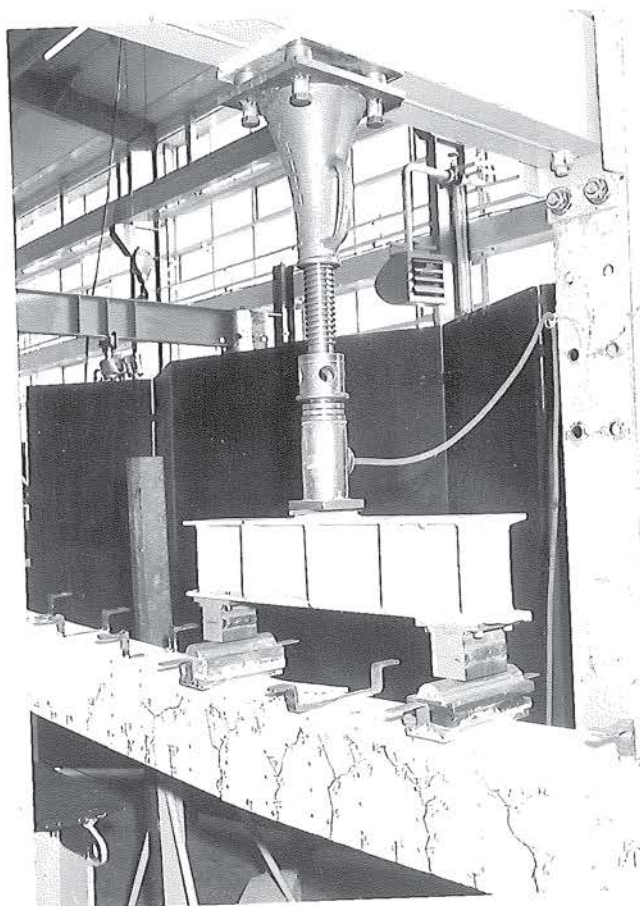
SCREW JACK LOAD-CELL LOADING SYSTEM. Also shows
